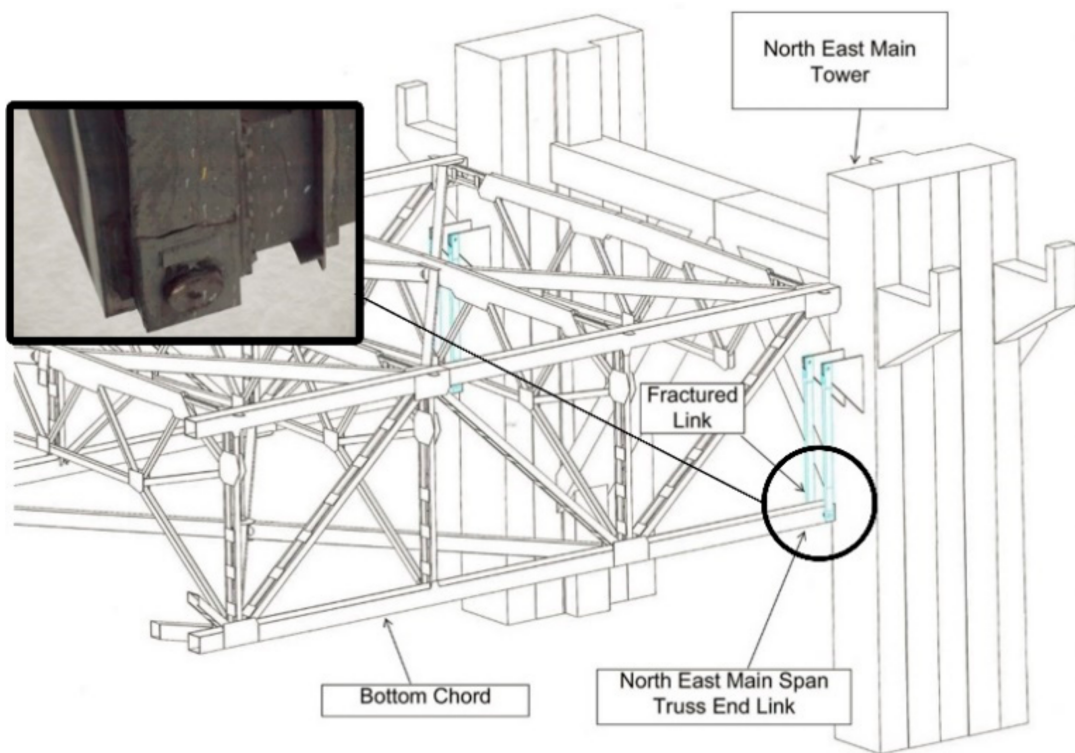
Cracked north east truss end link (Ni et al., 2019)
